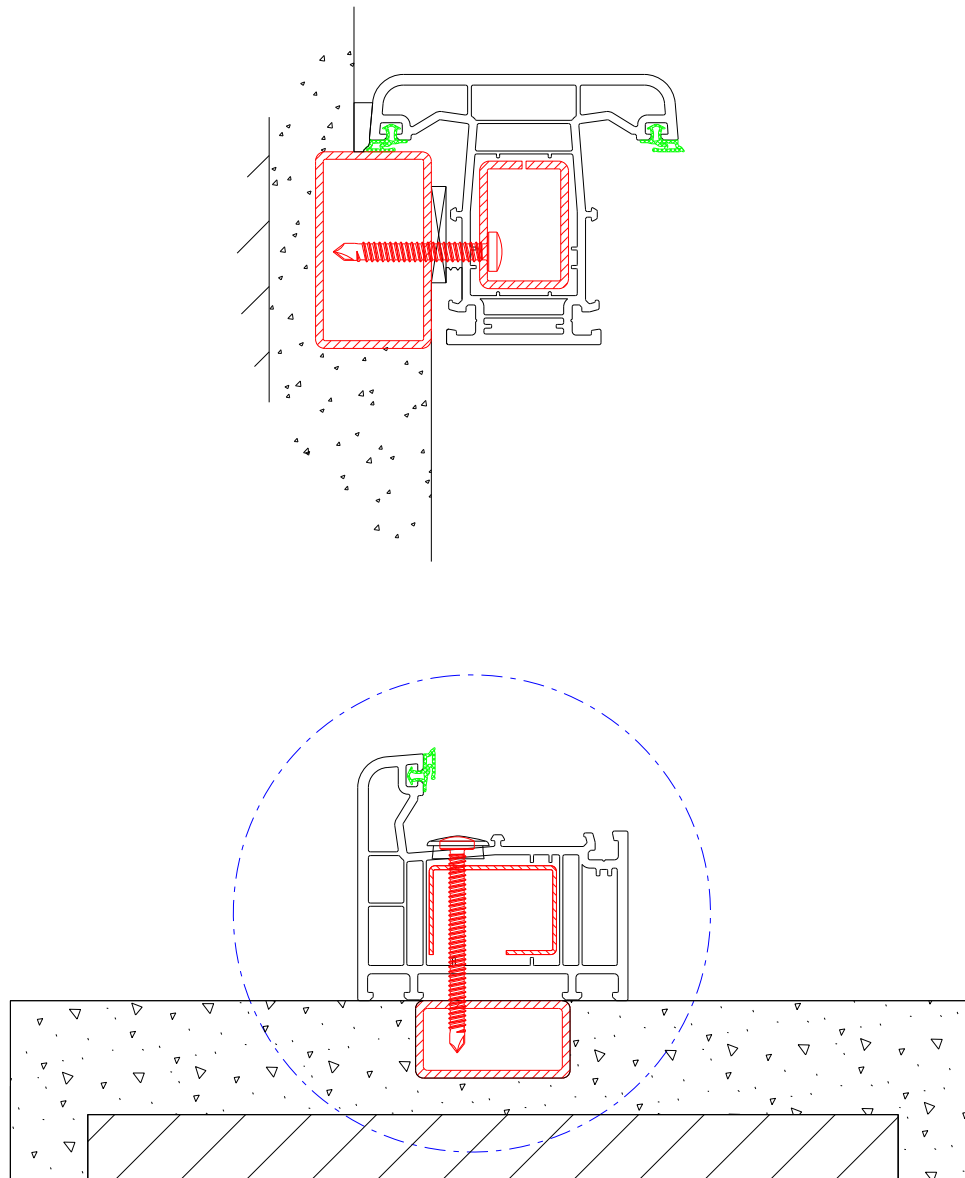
Case of steel mounting applications with standard frame and T-frame profiles
